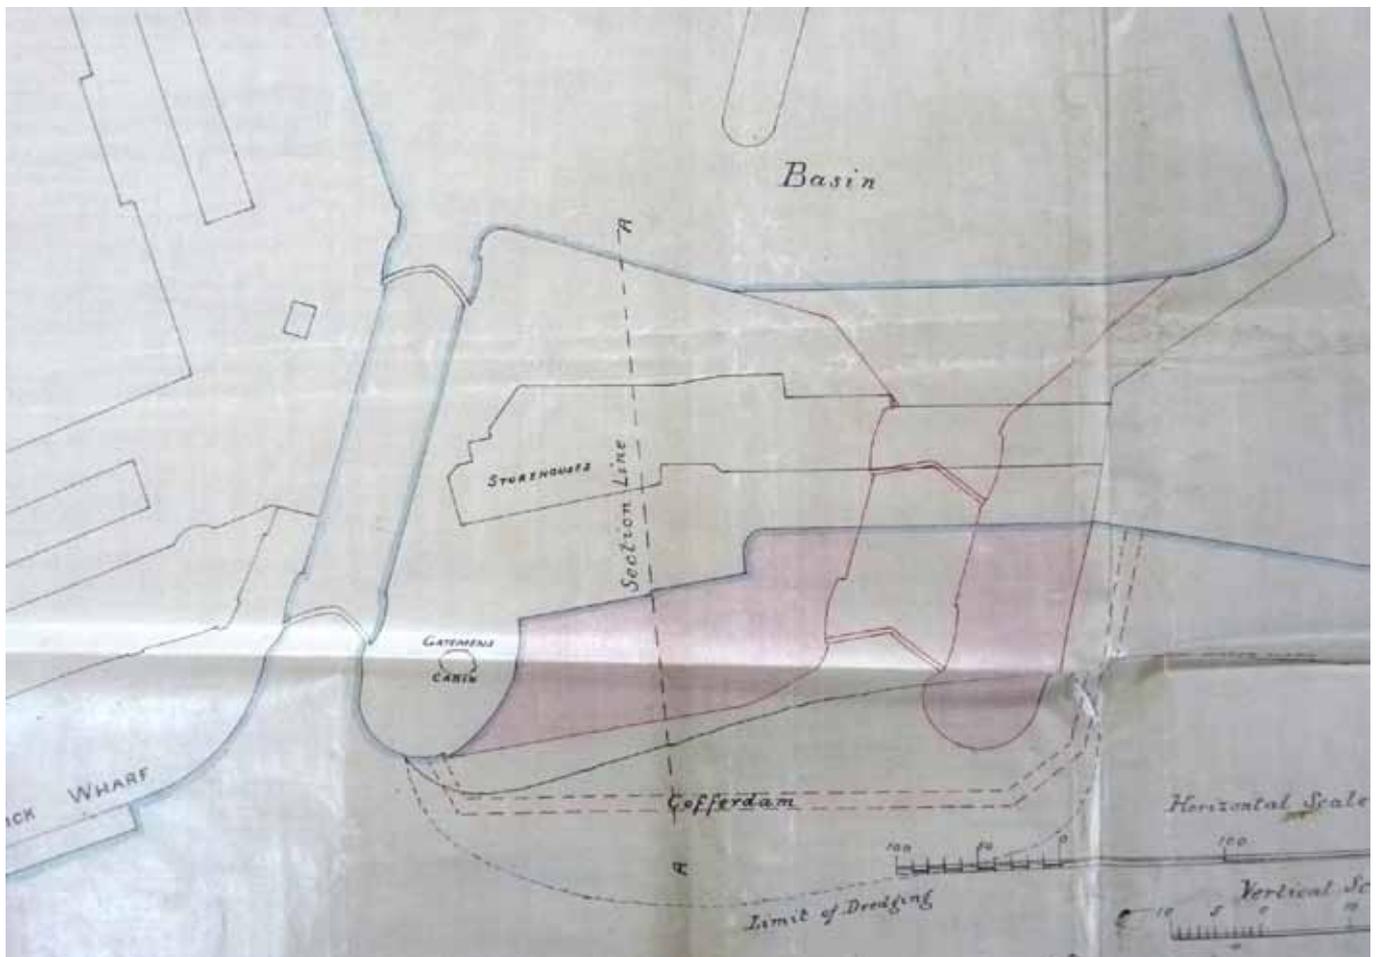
Plan of Proposed New Entrance to the East India Docks, 1875 - Detail (TNA)
